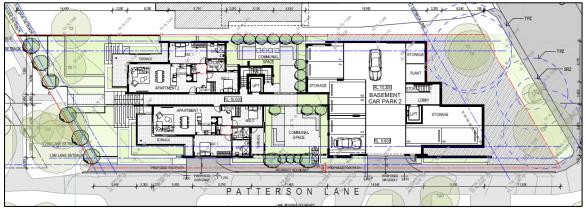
Proposed Lower Ground Floor Plan. Setbacks to the southern boundary have been substantially increased and are now approximately 8m to 12.2m to the terraces and 11.2m and 13.5m to the closet point of the internal walls, resulting in a more appropriate built form transition to Dunbar Park. Landscaping / open space proximate to Dunbar Park have similarly increased.
